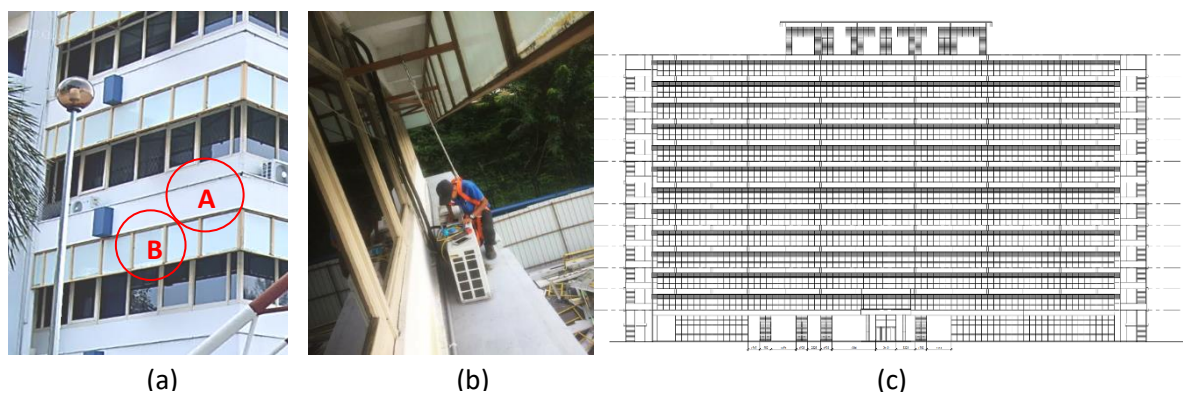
Case building of Wisma Persekutuan Seremban: a) Existing shading devices, A-concrete ledge, B-polycarbonate horizontal shading, b) Concrete ledge shading; and s) Front elevation drawing.
